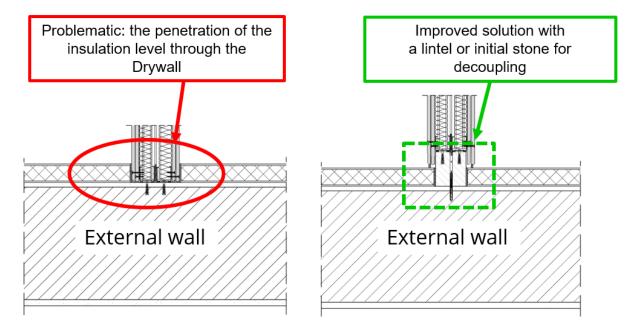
Connection of a new drywall to be erected to an internally insulated exterior wall, left: Standard connection, right: with rim stone or lintel for hygric decoupling
